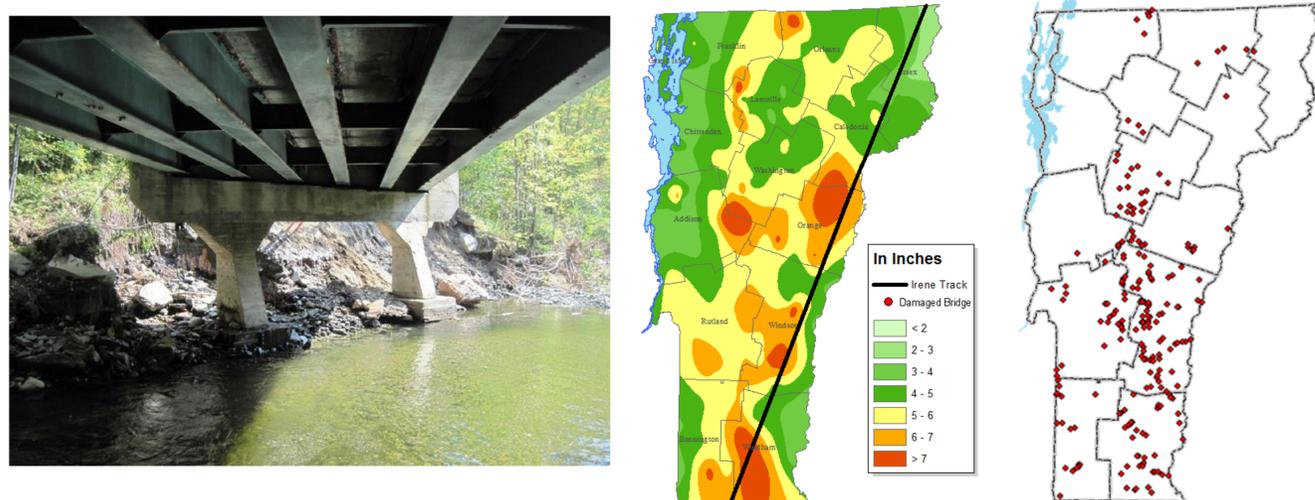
Bridge Scour, and Damaged Bridges in Vermont
